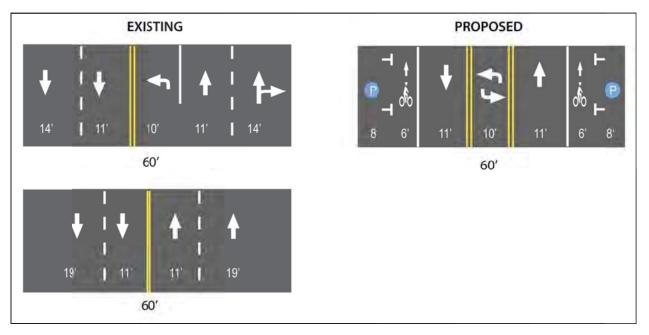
Hollenbeck Avenue Proposed Bike Lane Treatment
